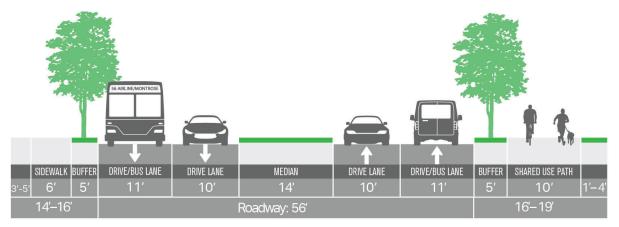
Recommended Typical Section: W Dallas Street to Allen Parkway
